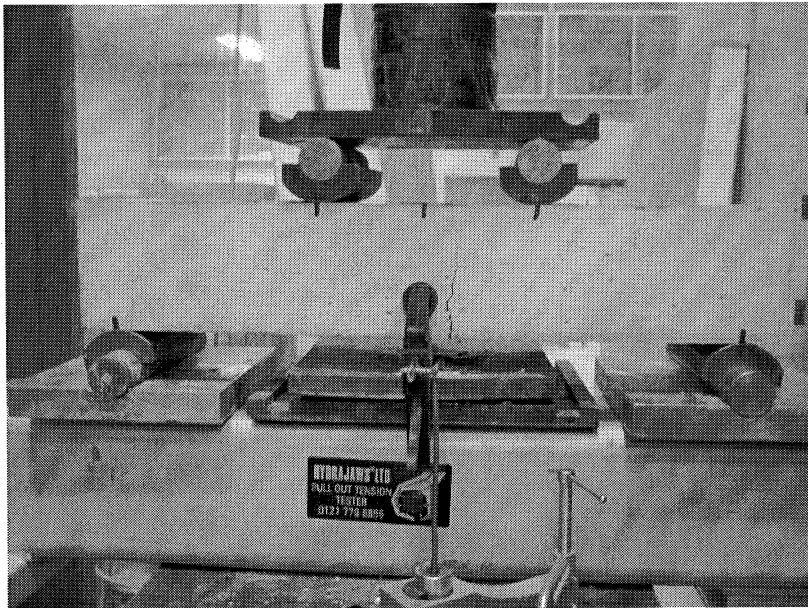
Test set-up and prism specimen under four point loading with LVDT
